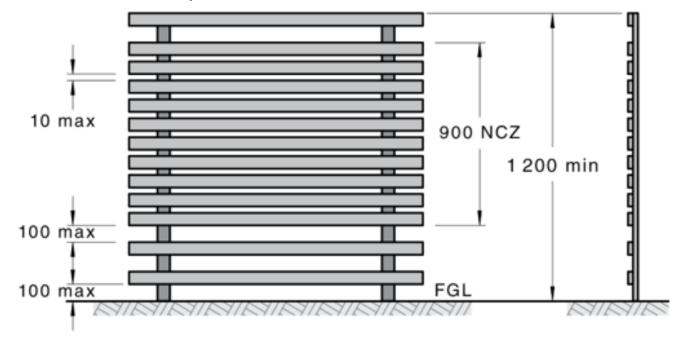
Example of horizontal slat construction for barriers of minimum height 1 200 mm
